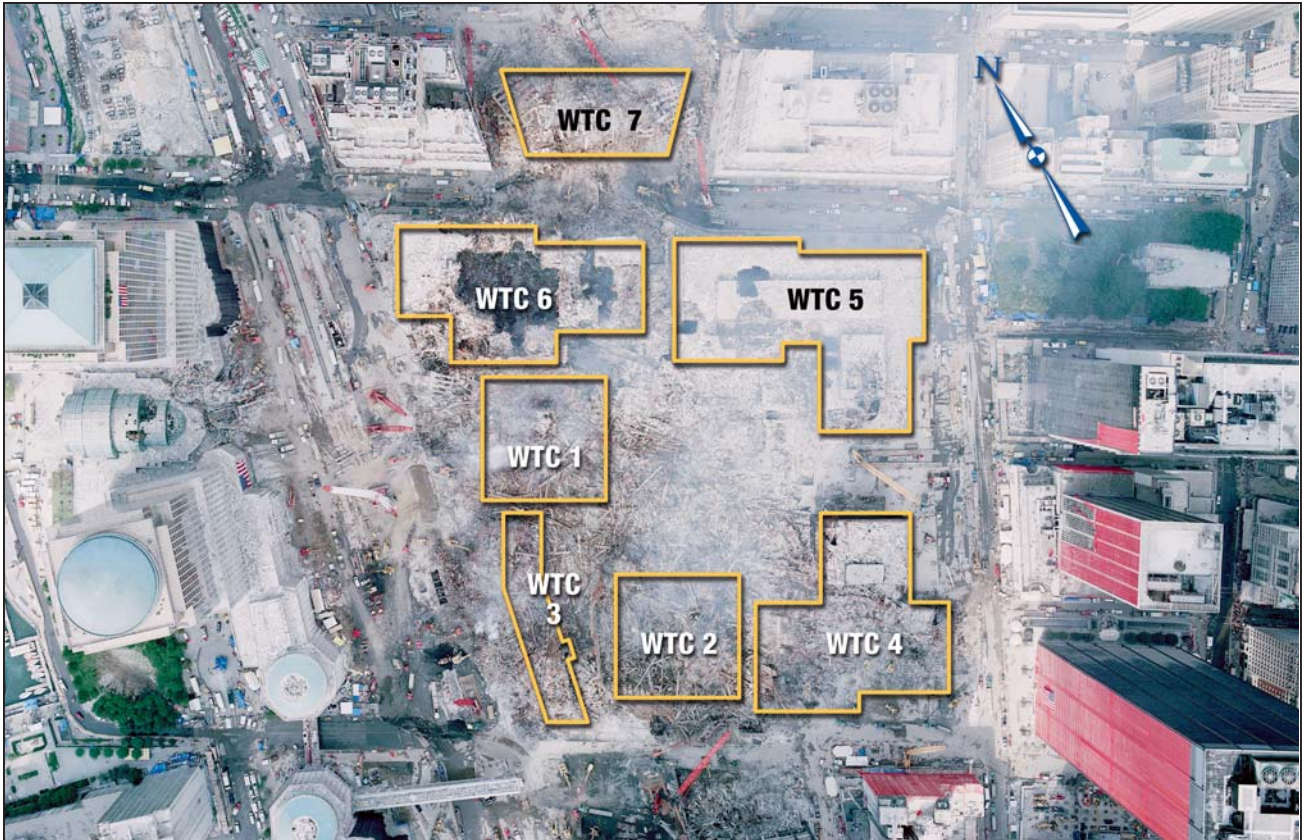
Aerial photograph of the WTC site after September 11 attack showing adjacent buildings damaged by debris from the collapse of WTC 1.
